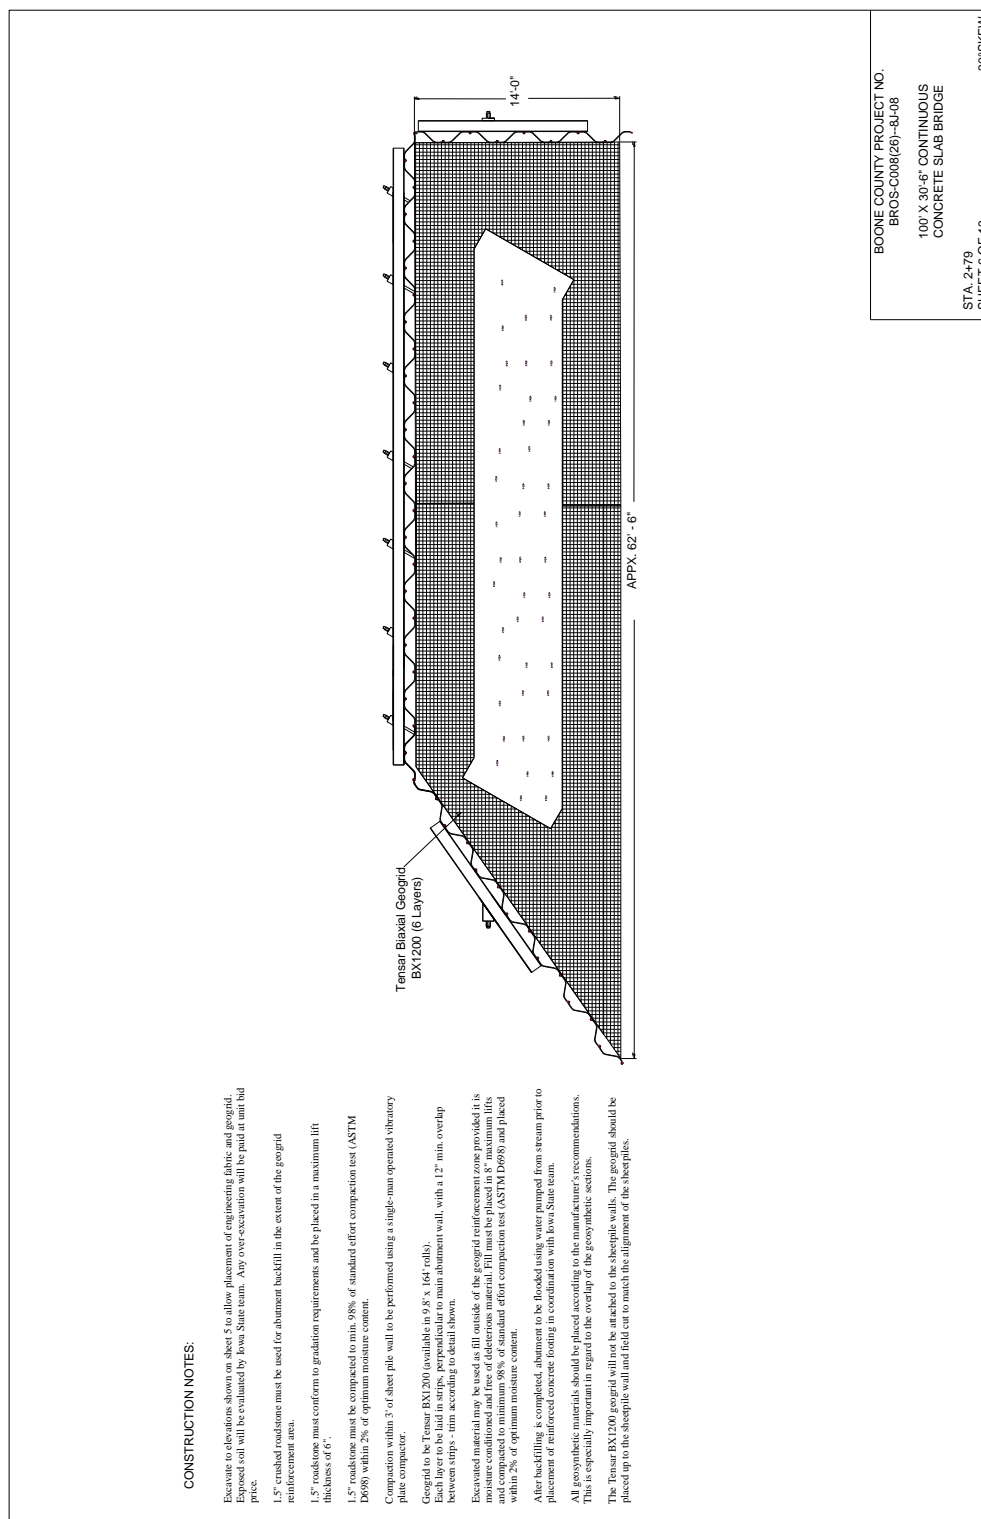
Plan view of abutment showing geogrid layout for demonstration project in BC, Iowa
